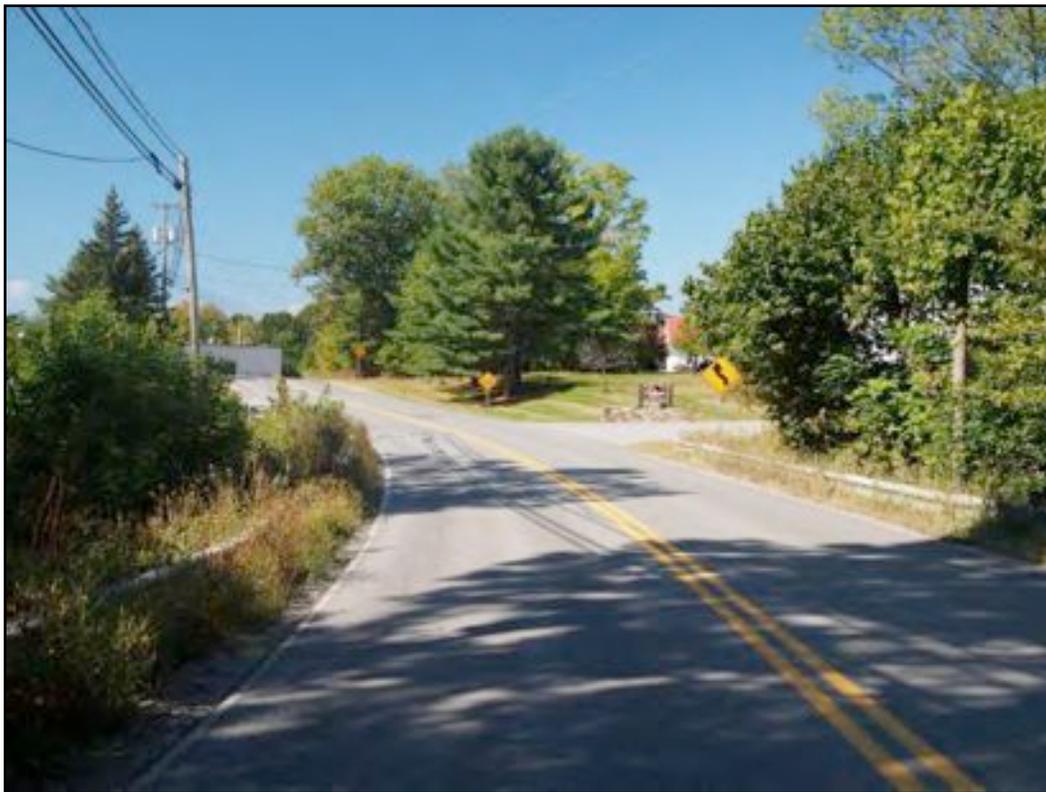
Richmond Road approaching 695 Richmond Road looking west
